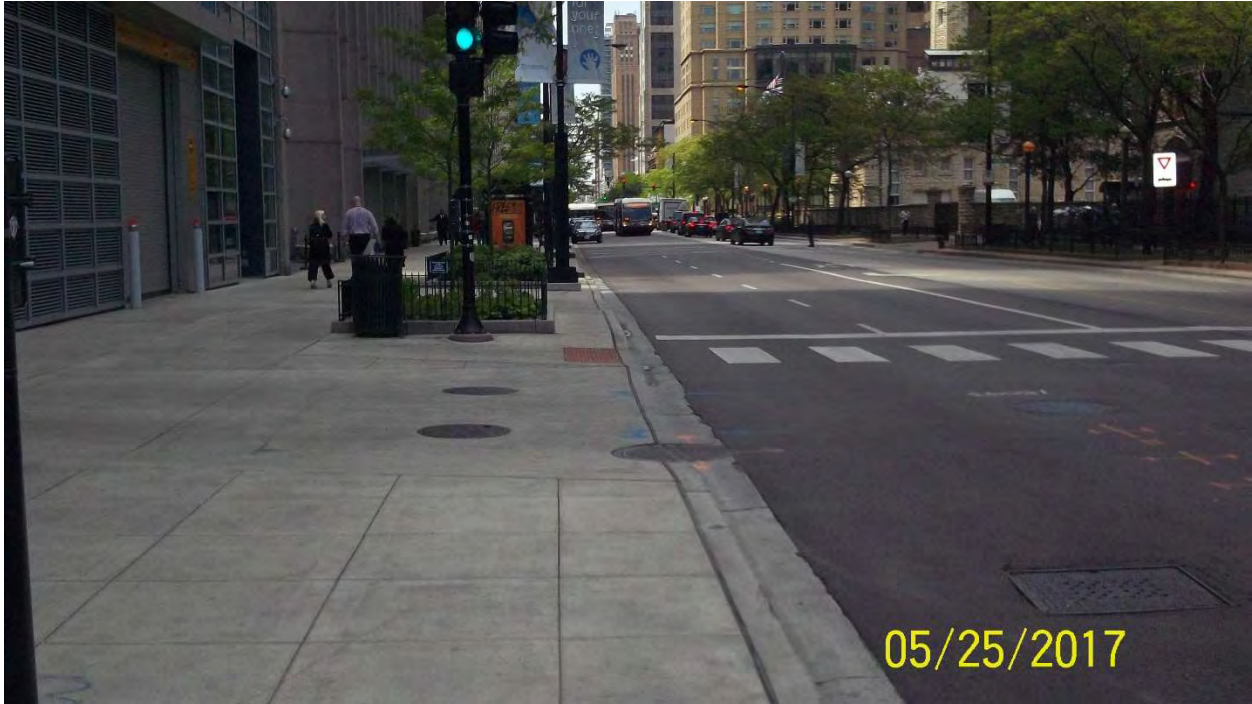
Southeast corner of Chicago Ave. / Mies van der Rohe – Looking West
